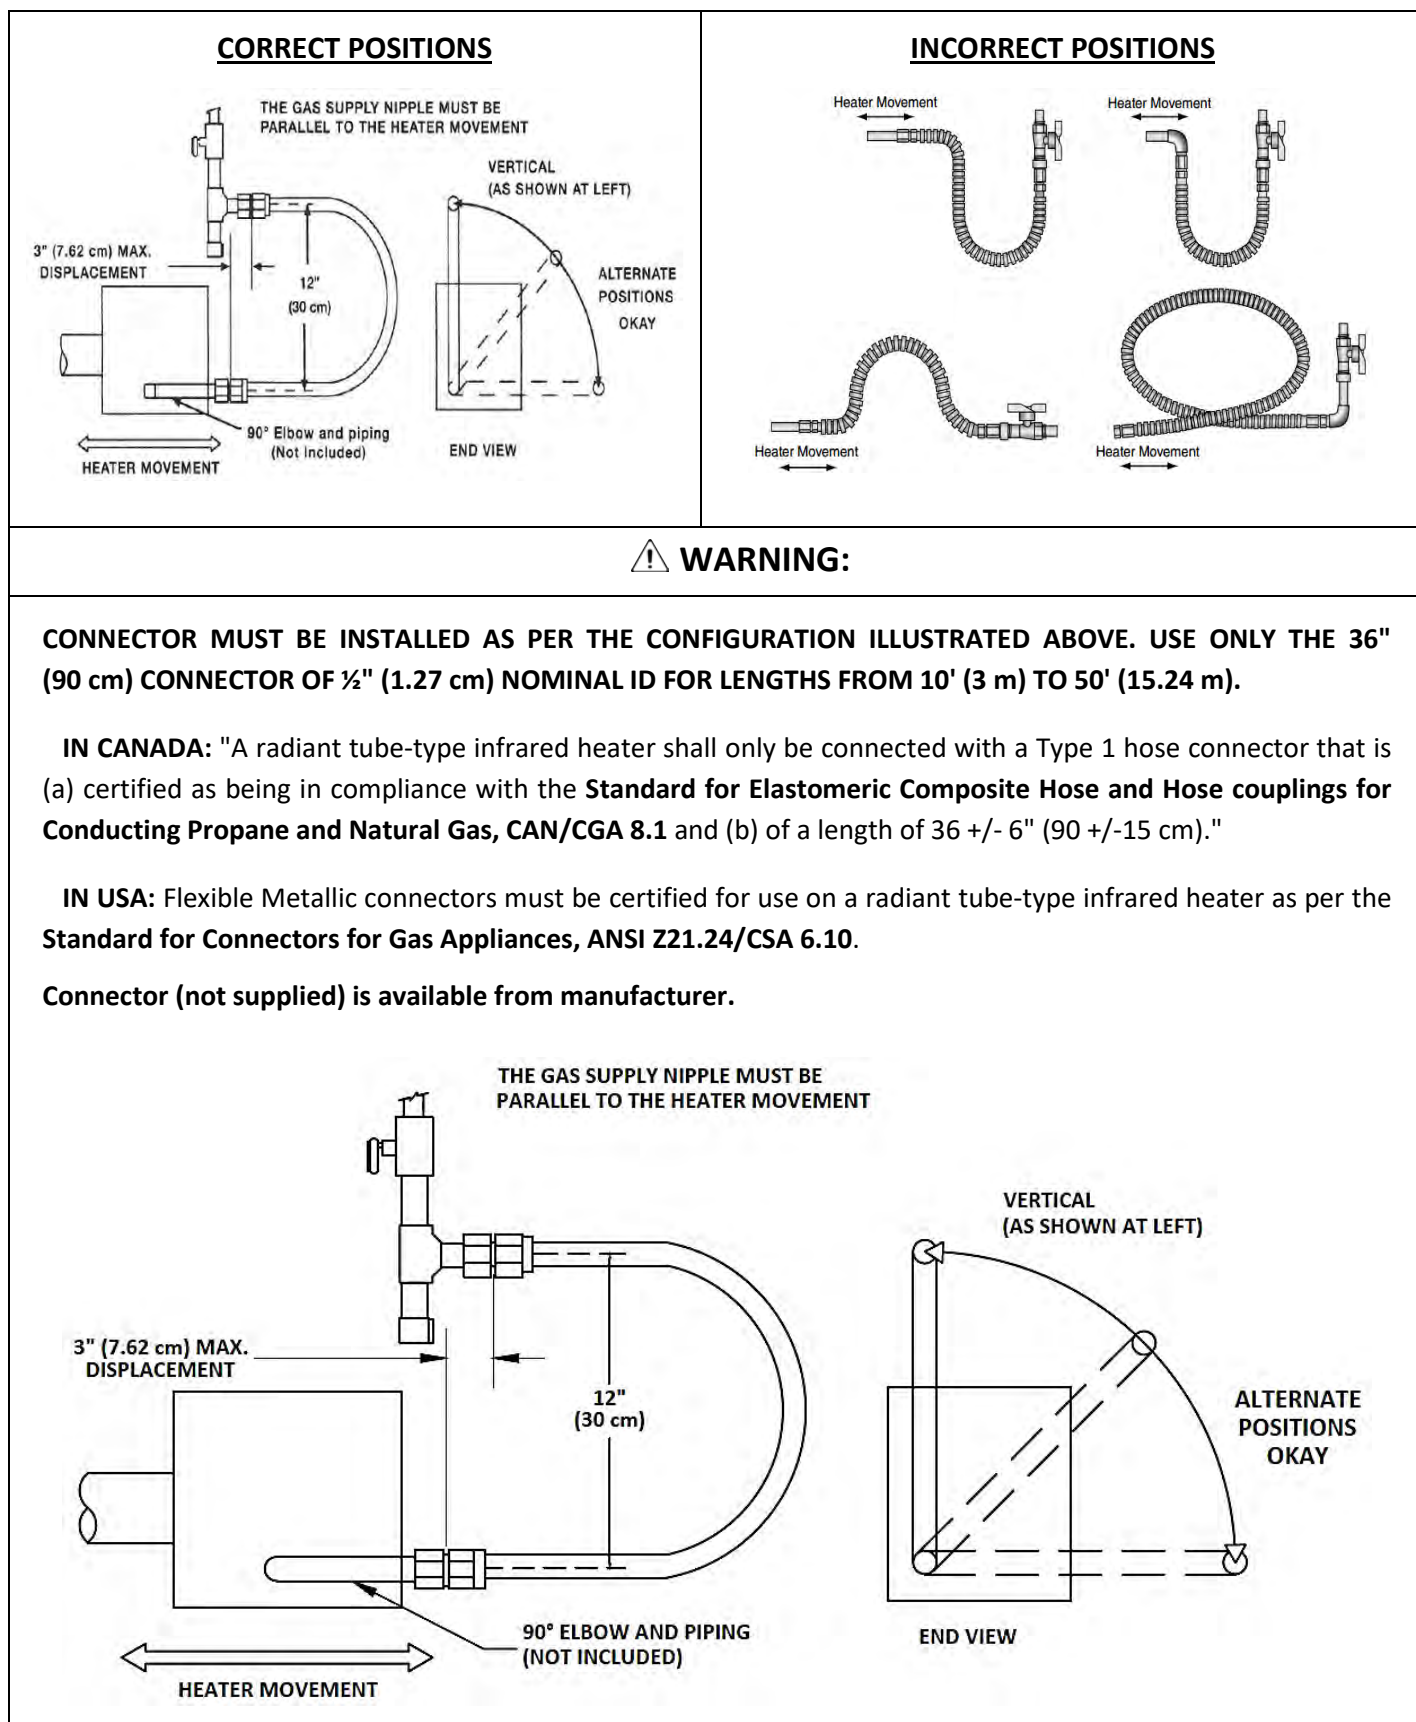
GAS LINE CONNECTION WITH CERTIFIED FLEXIBLE GAS CONNECTION
